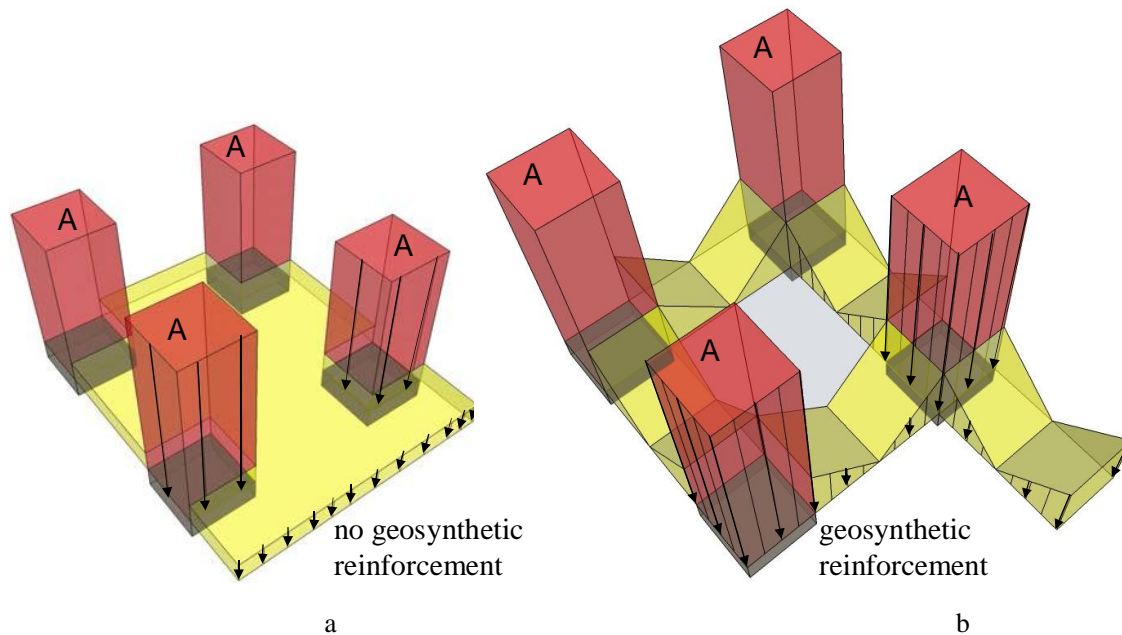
Schematized load distribution over subsoil and piles (a) just above the piles or pile caps in a piled embankment without GR and (b) just above the GR.
